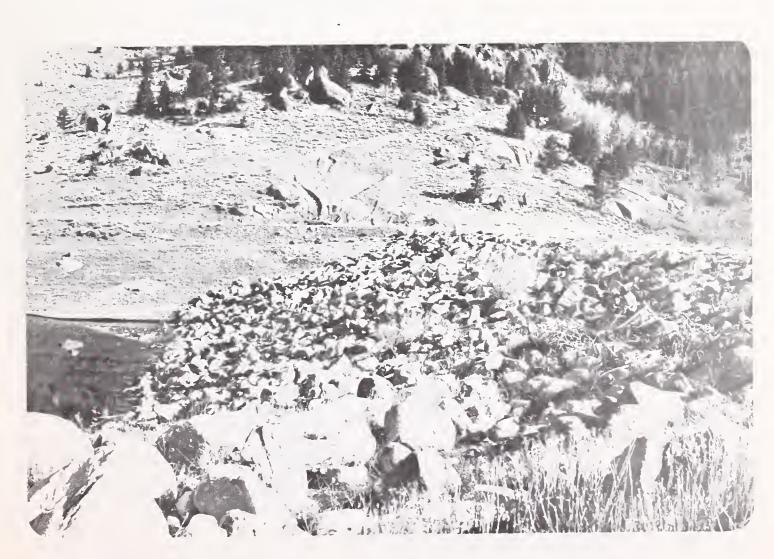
View towards left abutment and impervious borrow above dam crest.
